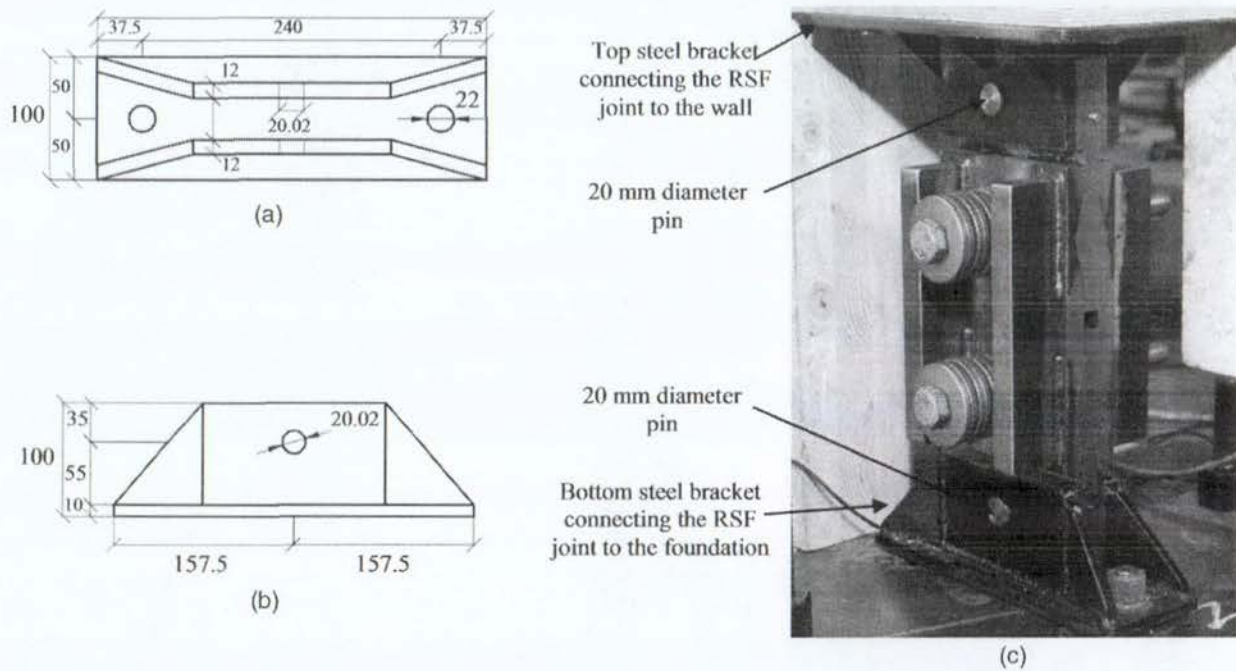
RSF joint assembly (dimensions in millimeters): (a) steel bracket connecting the RSF joint to the steel foundation (plan view); (b) steel bracket connecting the RSF joint to the steel foundation (side view); (c) RSF joint assembly
